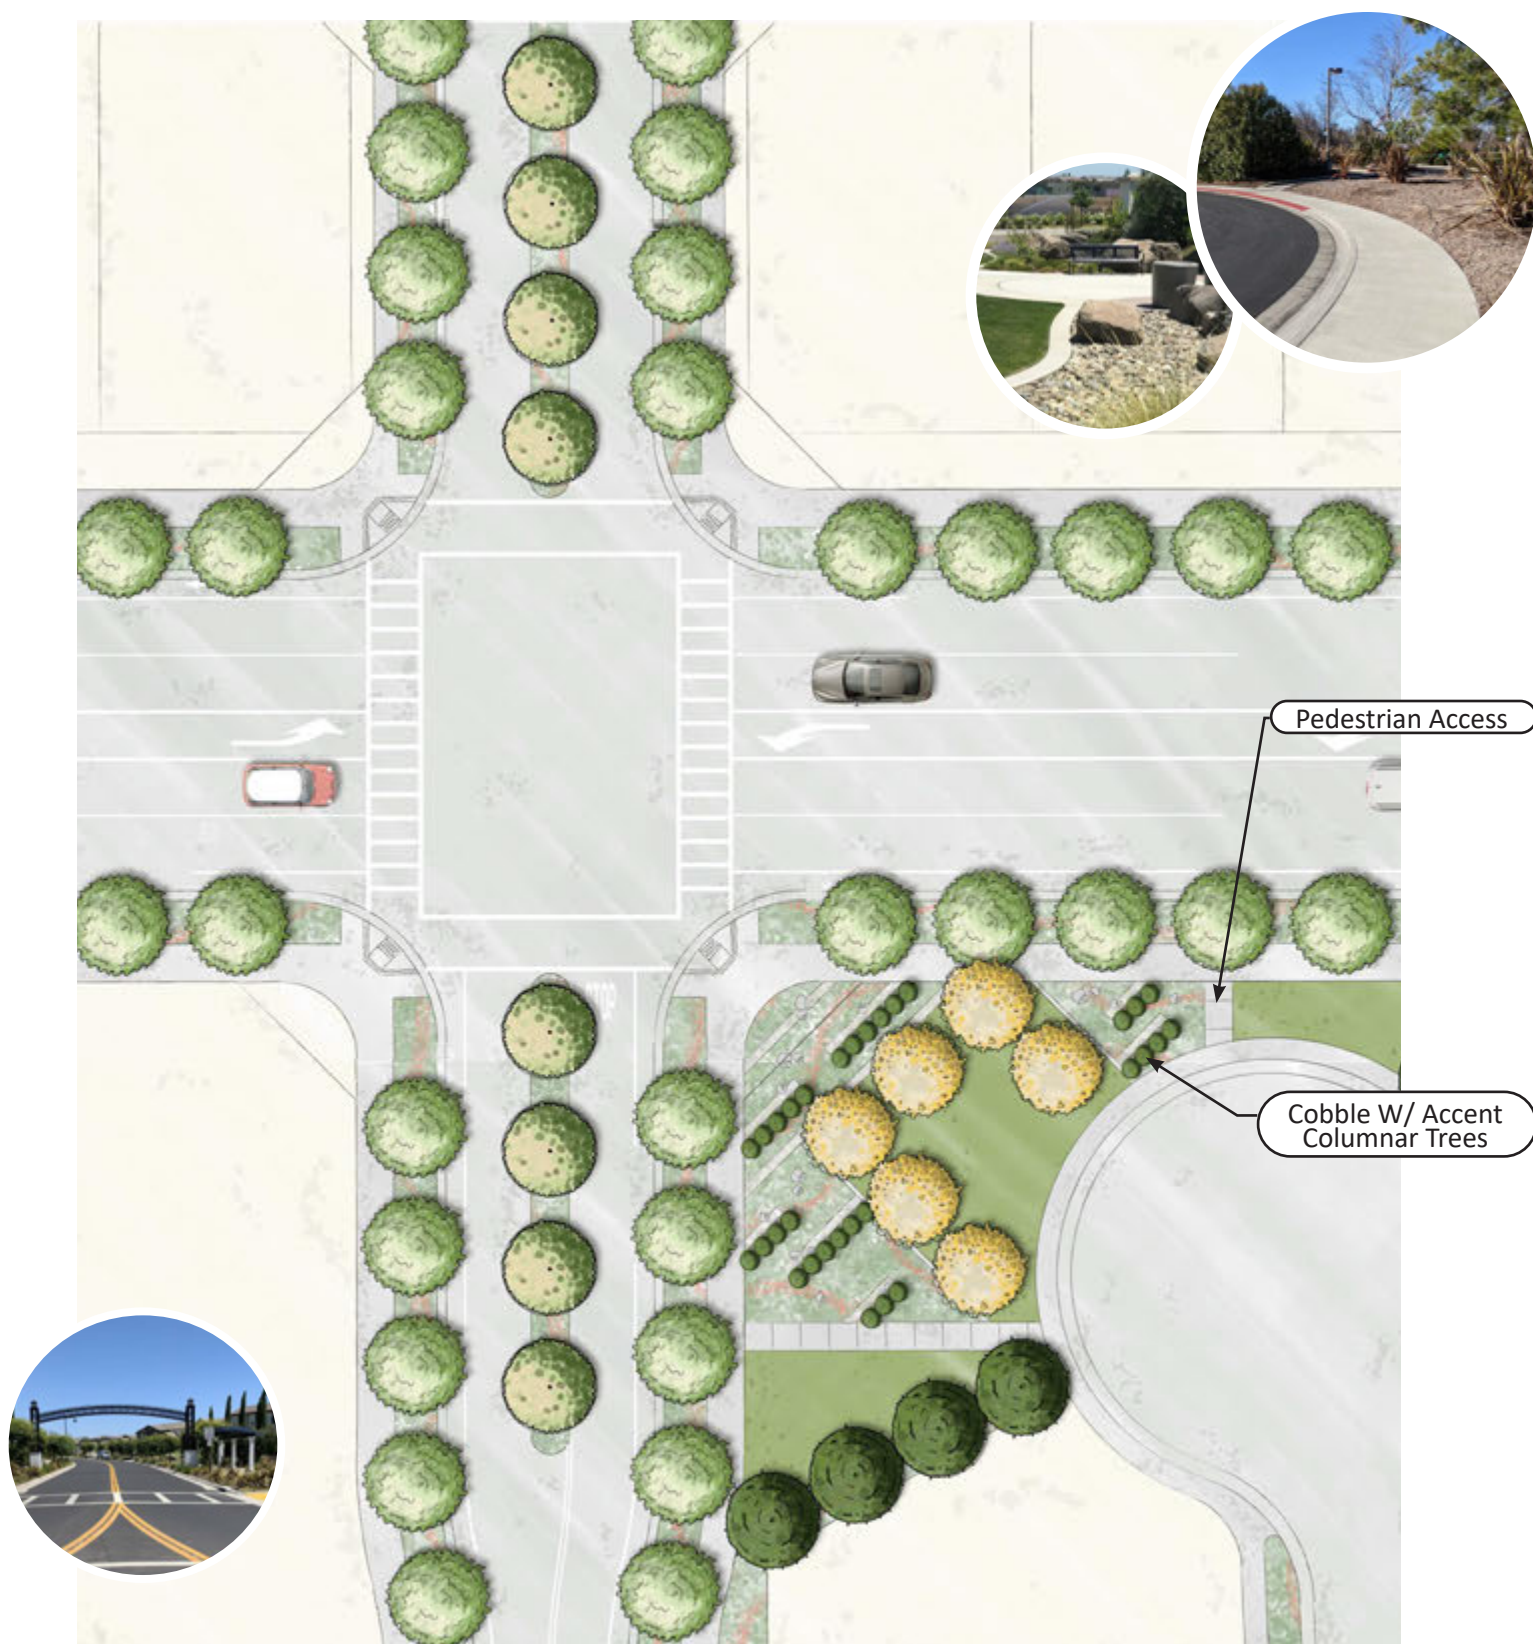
B STREET AND RIVER ISLANDS PARKWAY COMMUNITY GATEWAY CONCEPT PLAN
